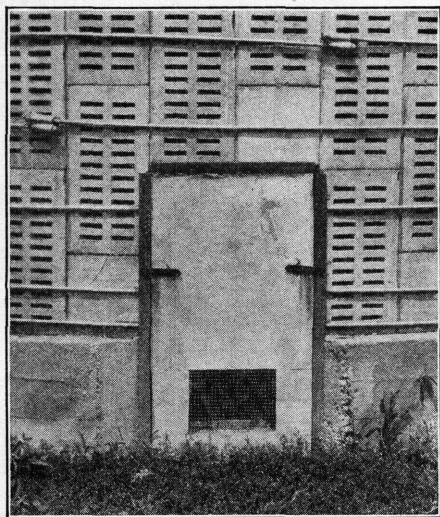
Rectangular concrete corner crib staves, with interstices small enough to keep out rats, resting on substantial concrete foundations; hoops anchored to channel-iron doorframe; screened opening into shelling trench
